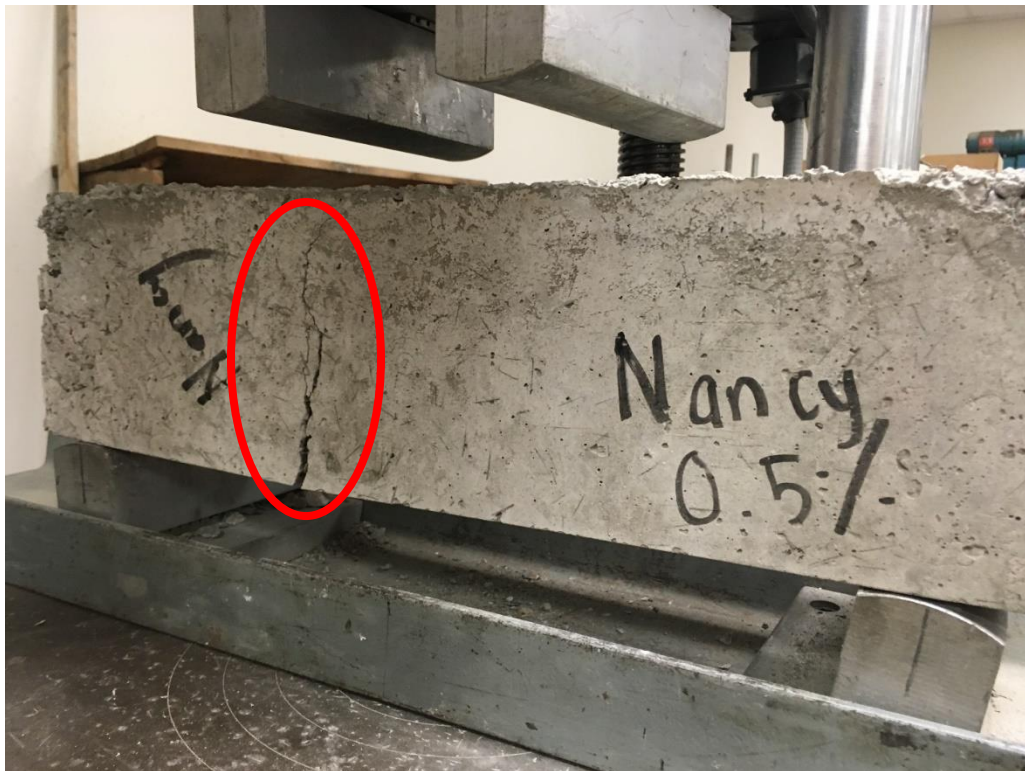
0.5% SFRC Beam at Failure Load 7.4 kips
